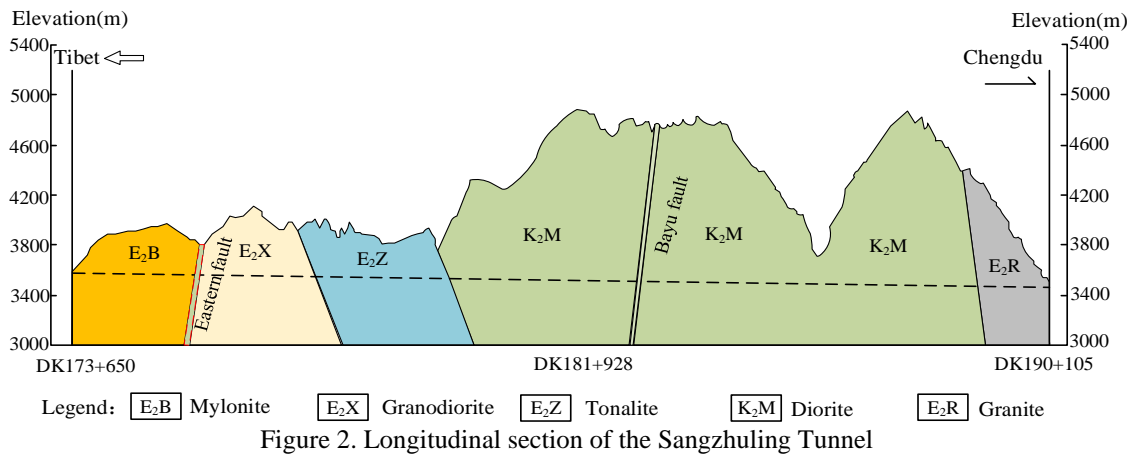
Longitudinal section of the Sangzhuling Tunnel
